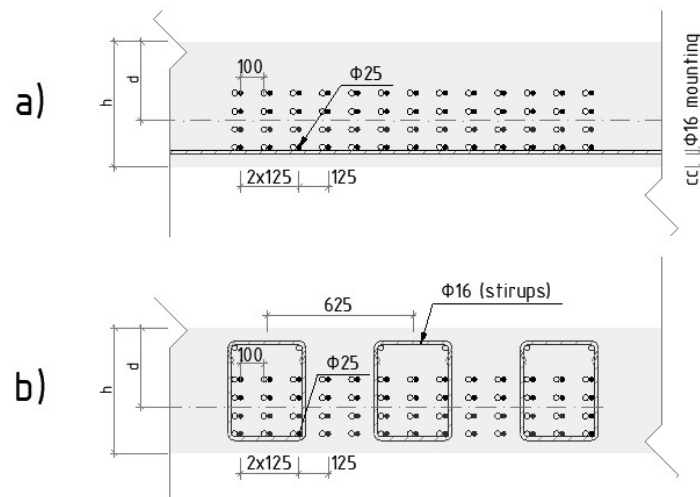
Reinforcement design with 4 layer of tension reinforcement. a) section without shear reinforcement. b) section with shear reinforcement.
